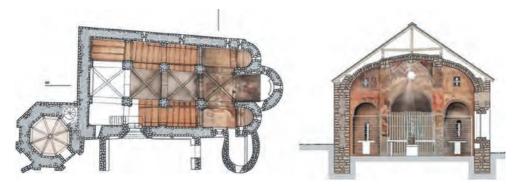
Plan and section of Sant Andrèu of Salardú [12].
